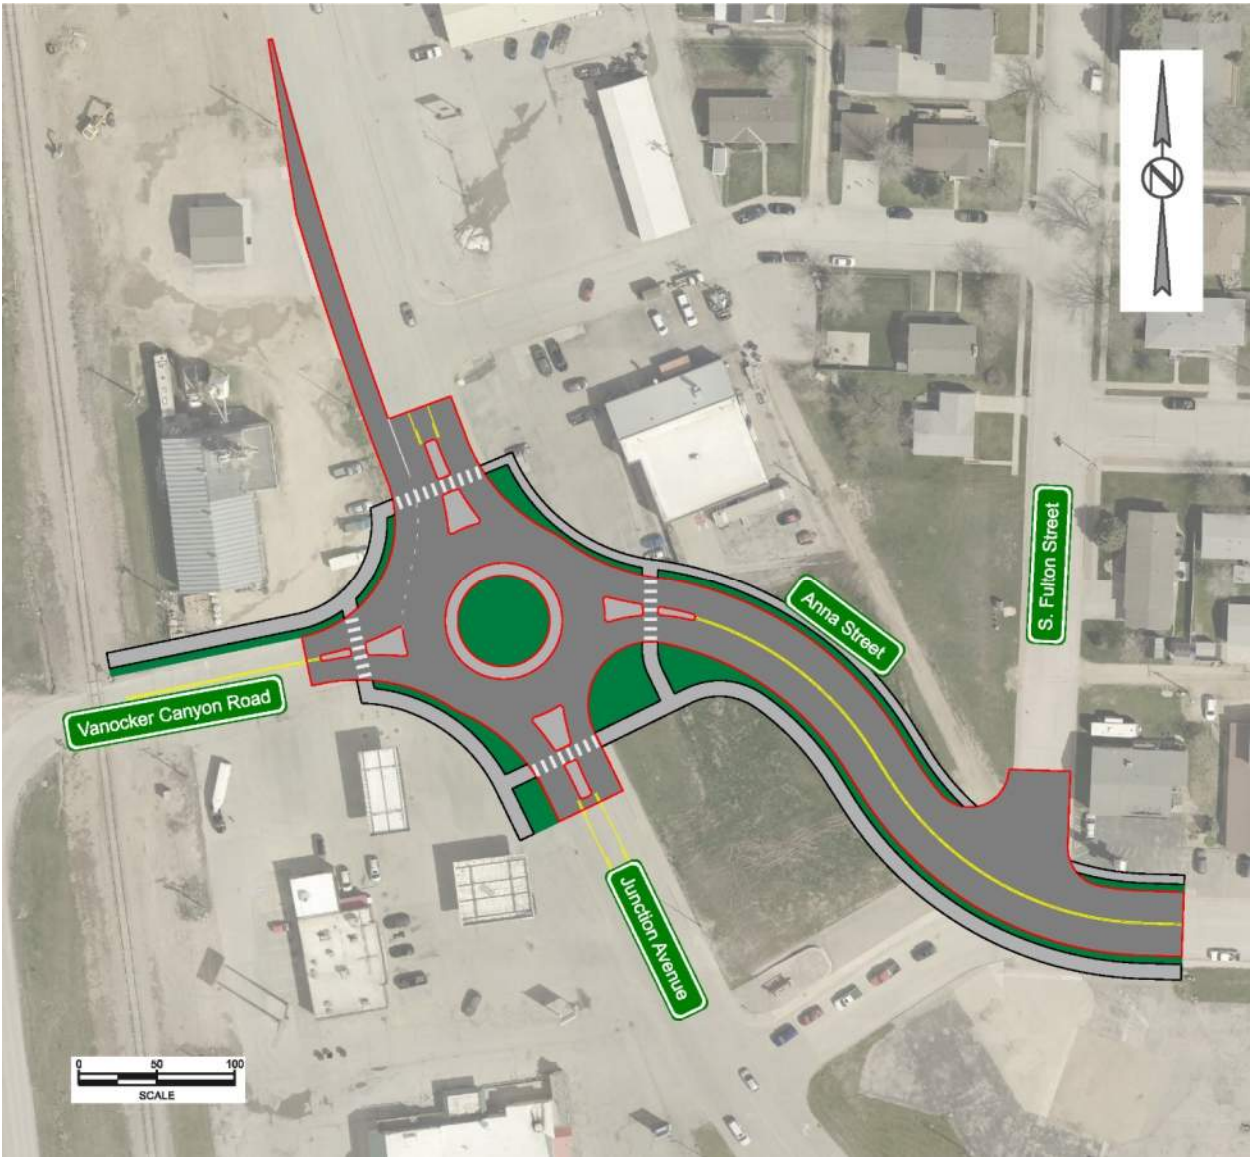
Realignment of Anna Street to Vanocker Canyon Road (Roundabout)
